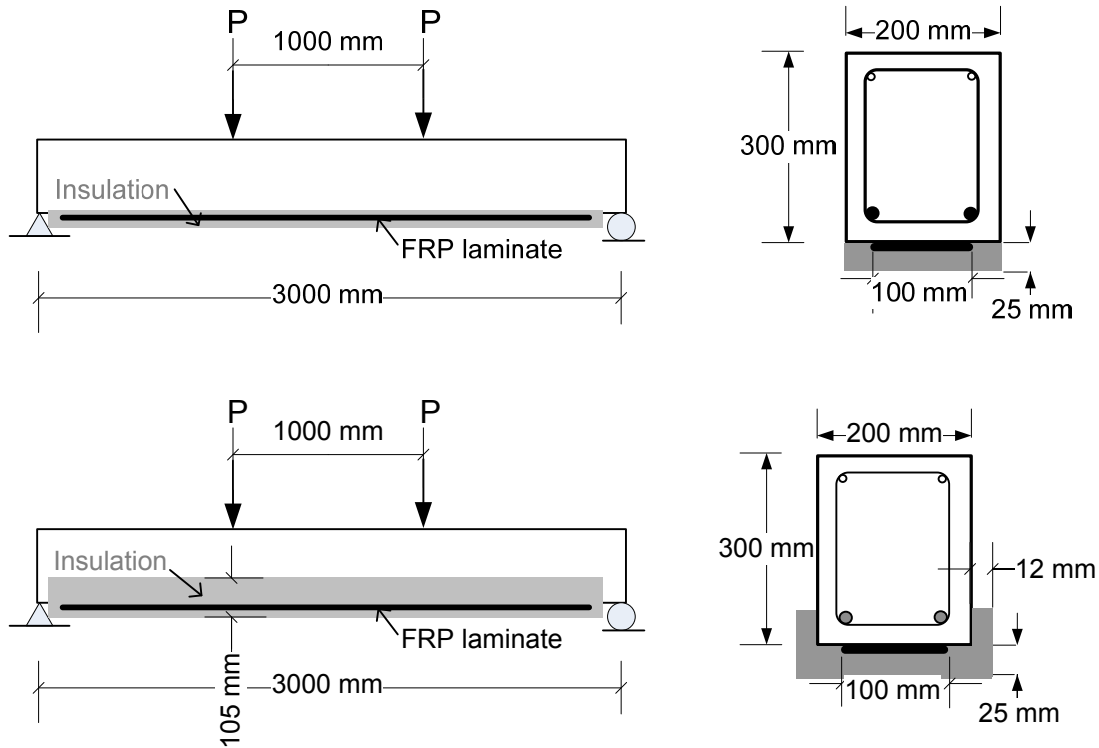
Elevation and cross section of beams tested by Blontrock et al.
